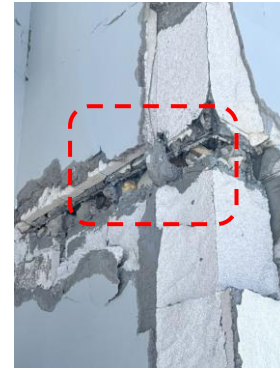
Rupture in stirrup and buckling of longitudinal reinforcement
